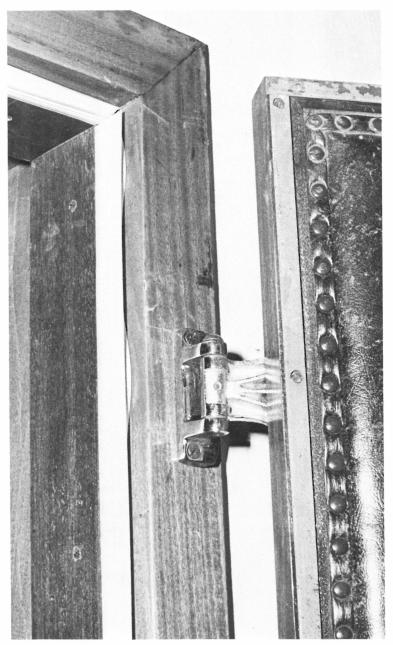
Heavy freezer door hinges are utilized to swing the heavy doors. The magnetic sealing strips and iron straps (see Fig. 8-12) are clearly seen at top, side, and bottom edges of the door and frame.
